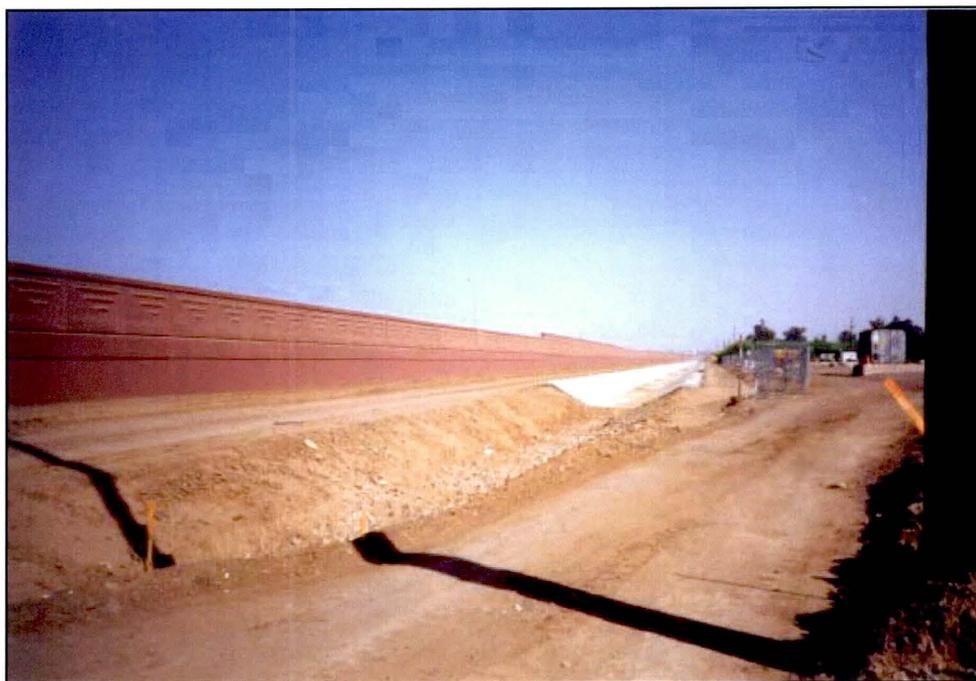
View from the south side of the Salt River at the end of Horne Street, looking east. Sound wall south of the Red Mountain Freeway extension is shown.
